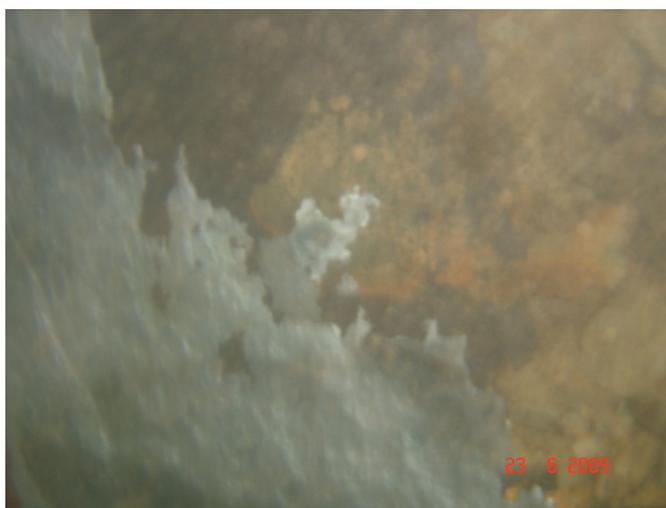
Wharf 403 Steel Sheet pile Wall (Stationn 0)
